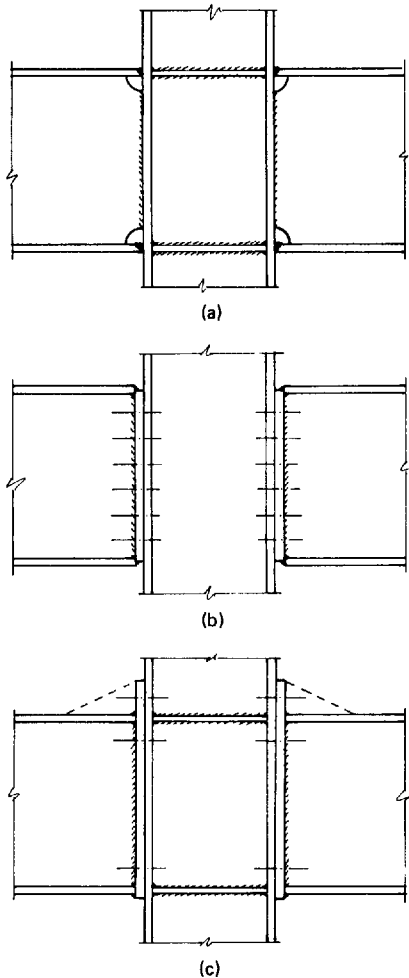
Connections for rigidly jointed frames. (a) All welded; (b) bolted with short end plate; (c) bolted with extended end plate
